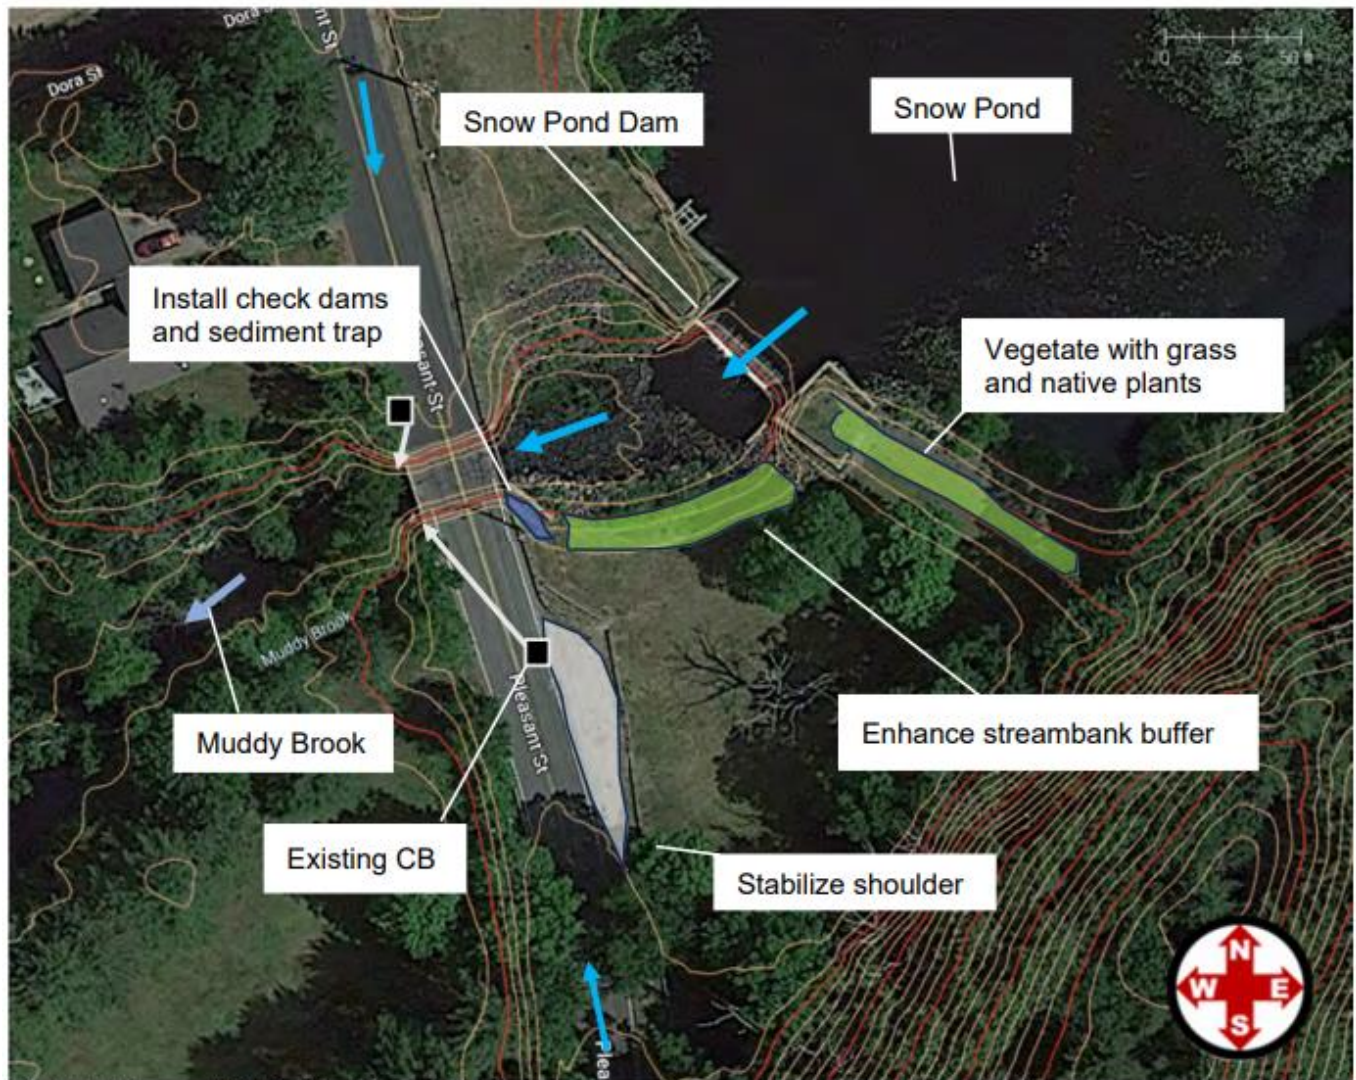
Proposed BMPs at the Snow Pond Dam
